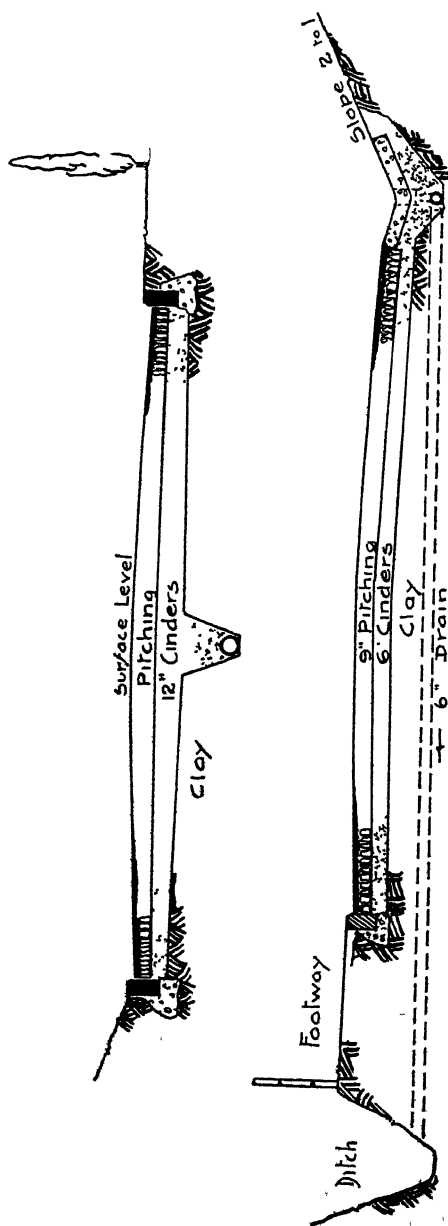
SECTIONS OF TWO TYPES OF FOUNDATION AND SUB-DRAINAGE
